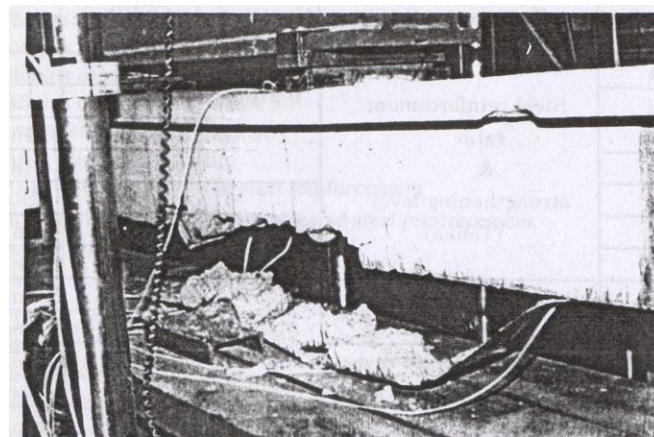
Interfacial shear failure of concrete and spalling of concrete cover (Tooth type failure) in beam.
